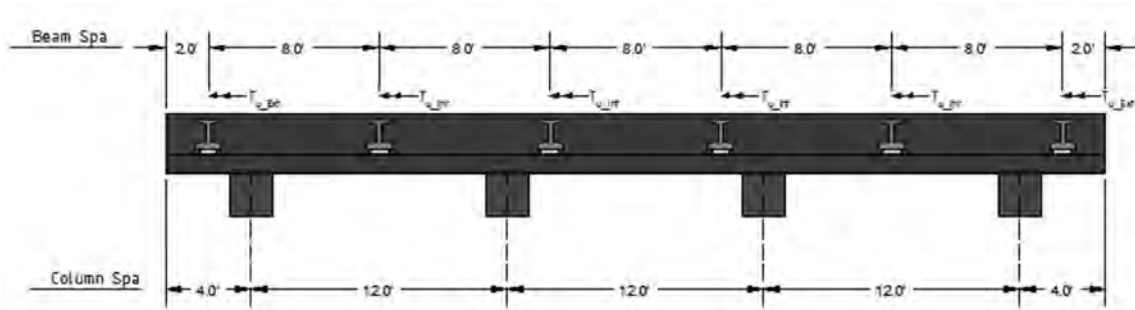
Elevation View of 45 Degrees Skewed ITBC with Torsion Loads
